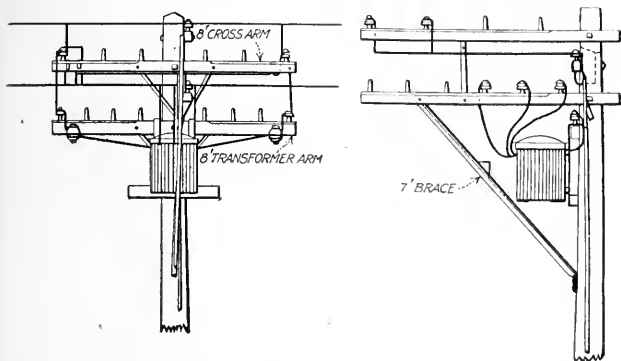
TYPICAL CONSTRUCTION FOR SMALL TRANSFORMER INSTALLATIONS
